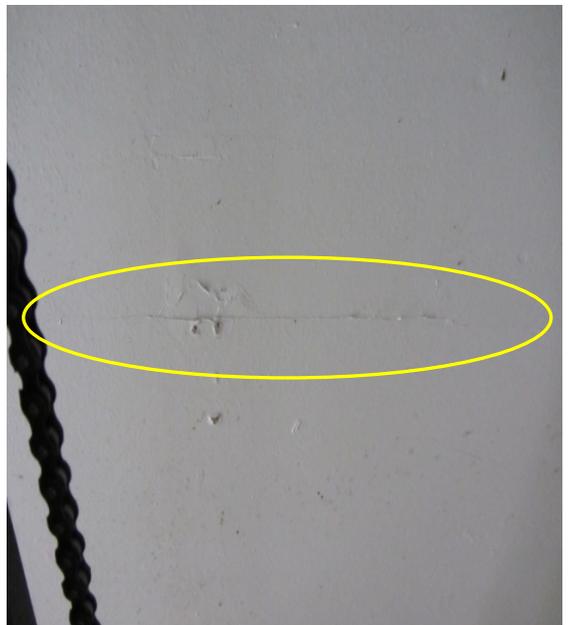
Hairline Cracking to Ceiling Lining Joint in NW Garage / Storage Room
